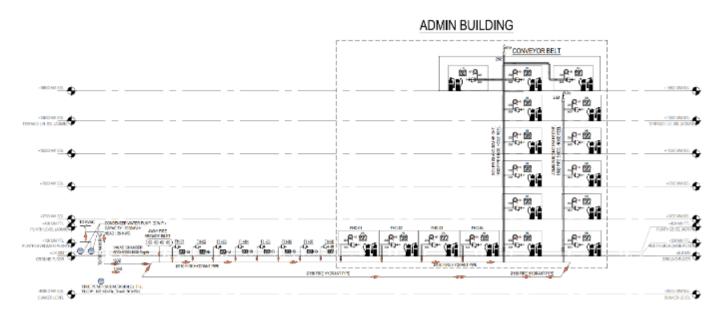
Fire Hydrant Master Plan and Fire Hydrant Plan for Admin Building
